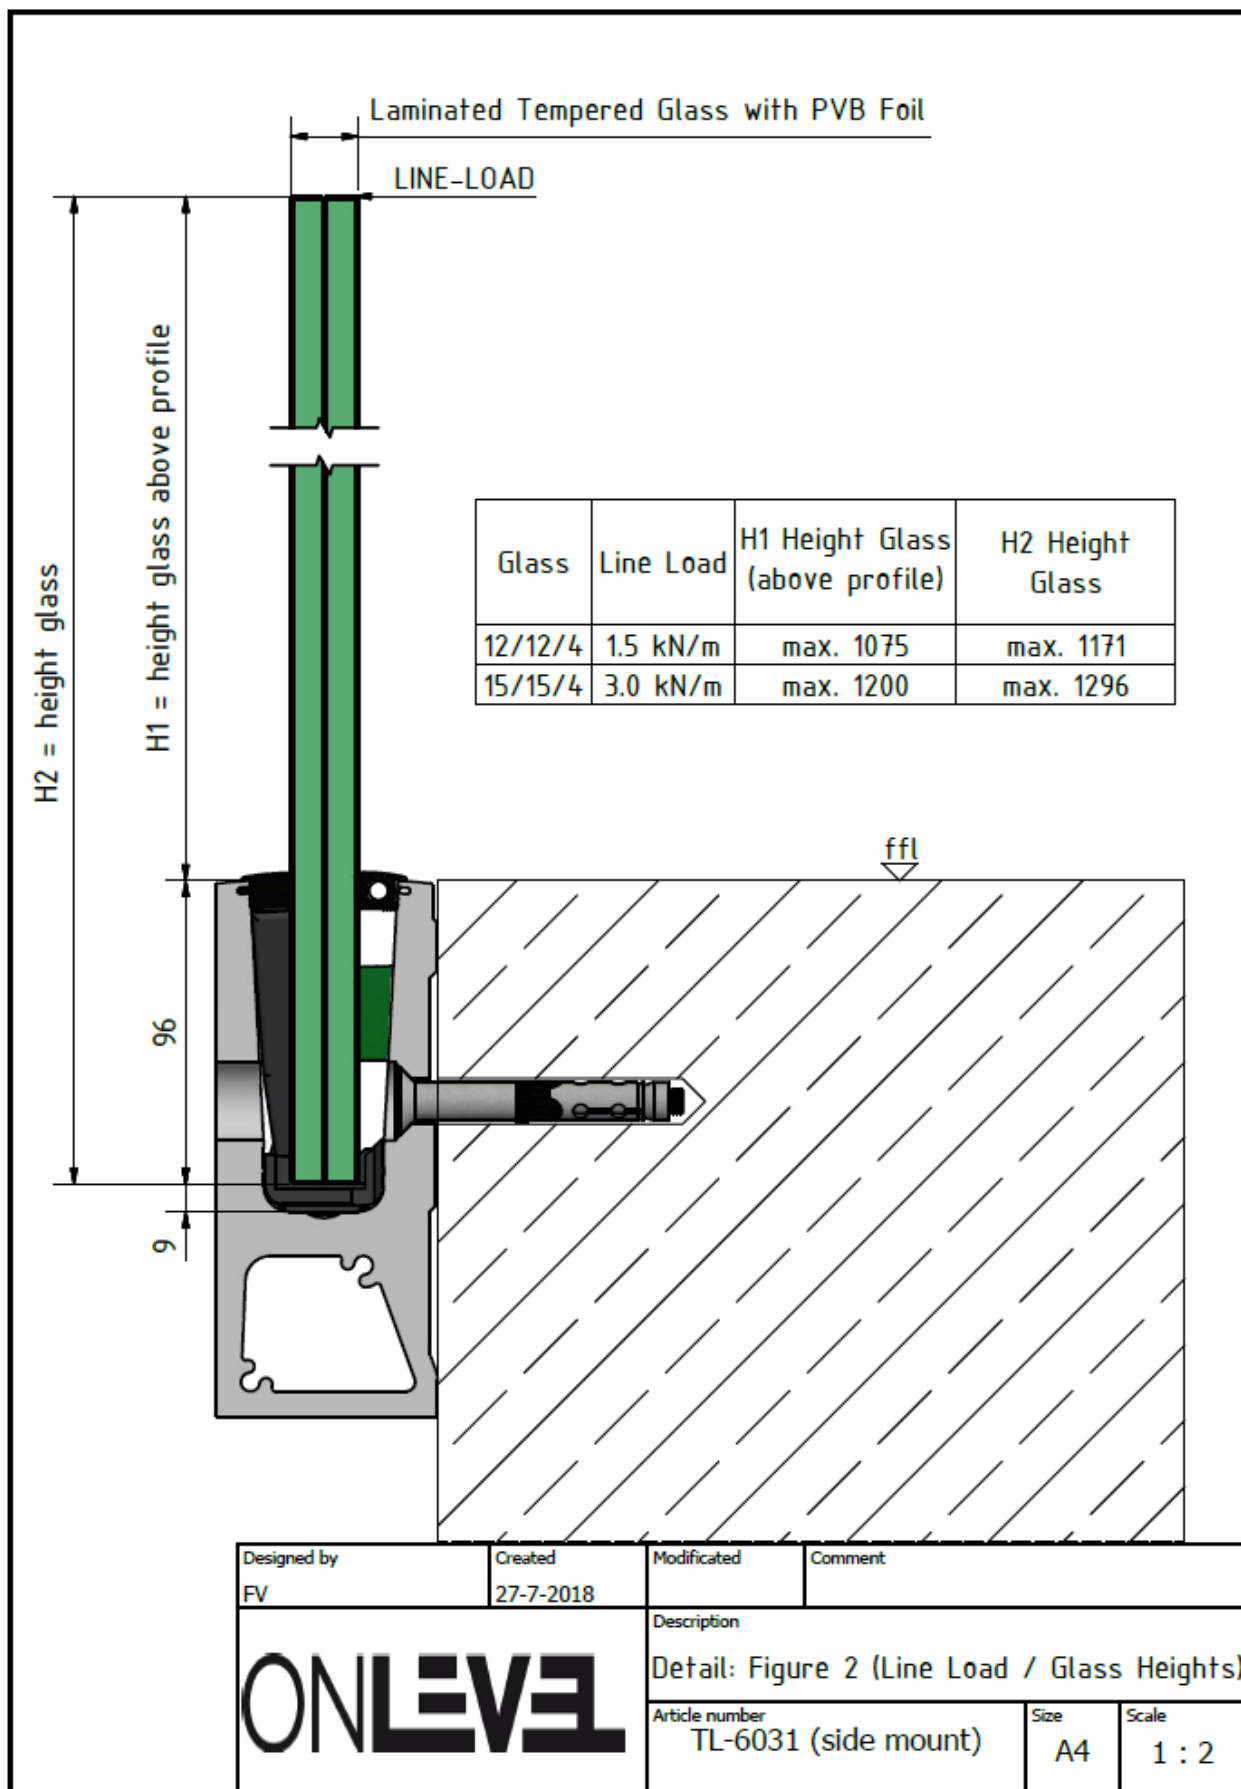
22. Product drawing from OnLevel for profile 6031 Side Mount – 3.0 kN/m, sheet 2 of 4.
